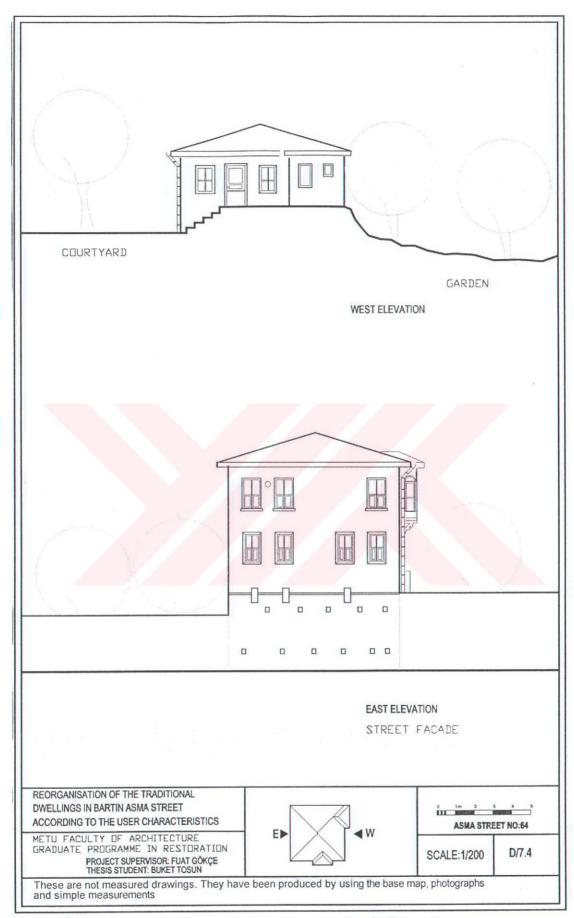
Sketch Drawings of Facades of the Building No:64
